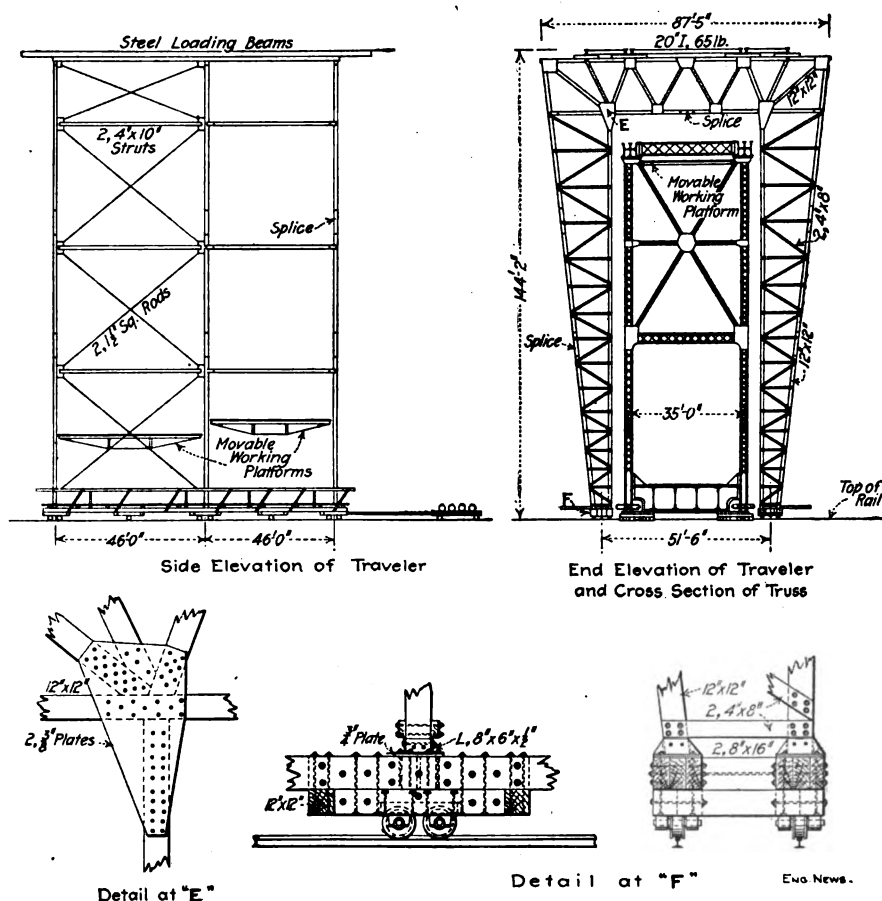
MAIN TRAVELER FOR ERECTING THE TRUSSES OF THE MUNICIPAL BRIDGE
